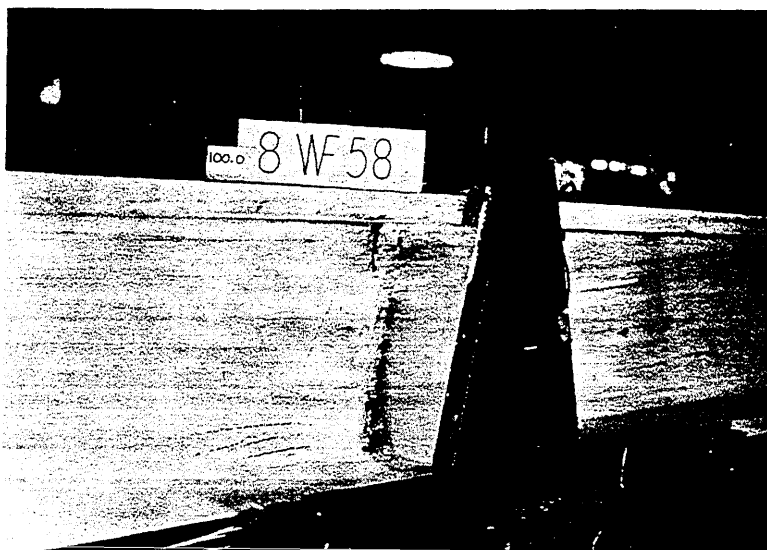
BEAM B1 - V-M SECTION - LOAD = 100 KIPS
